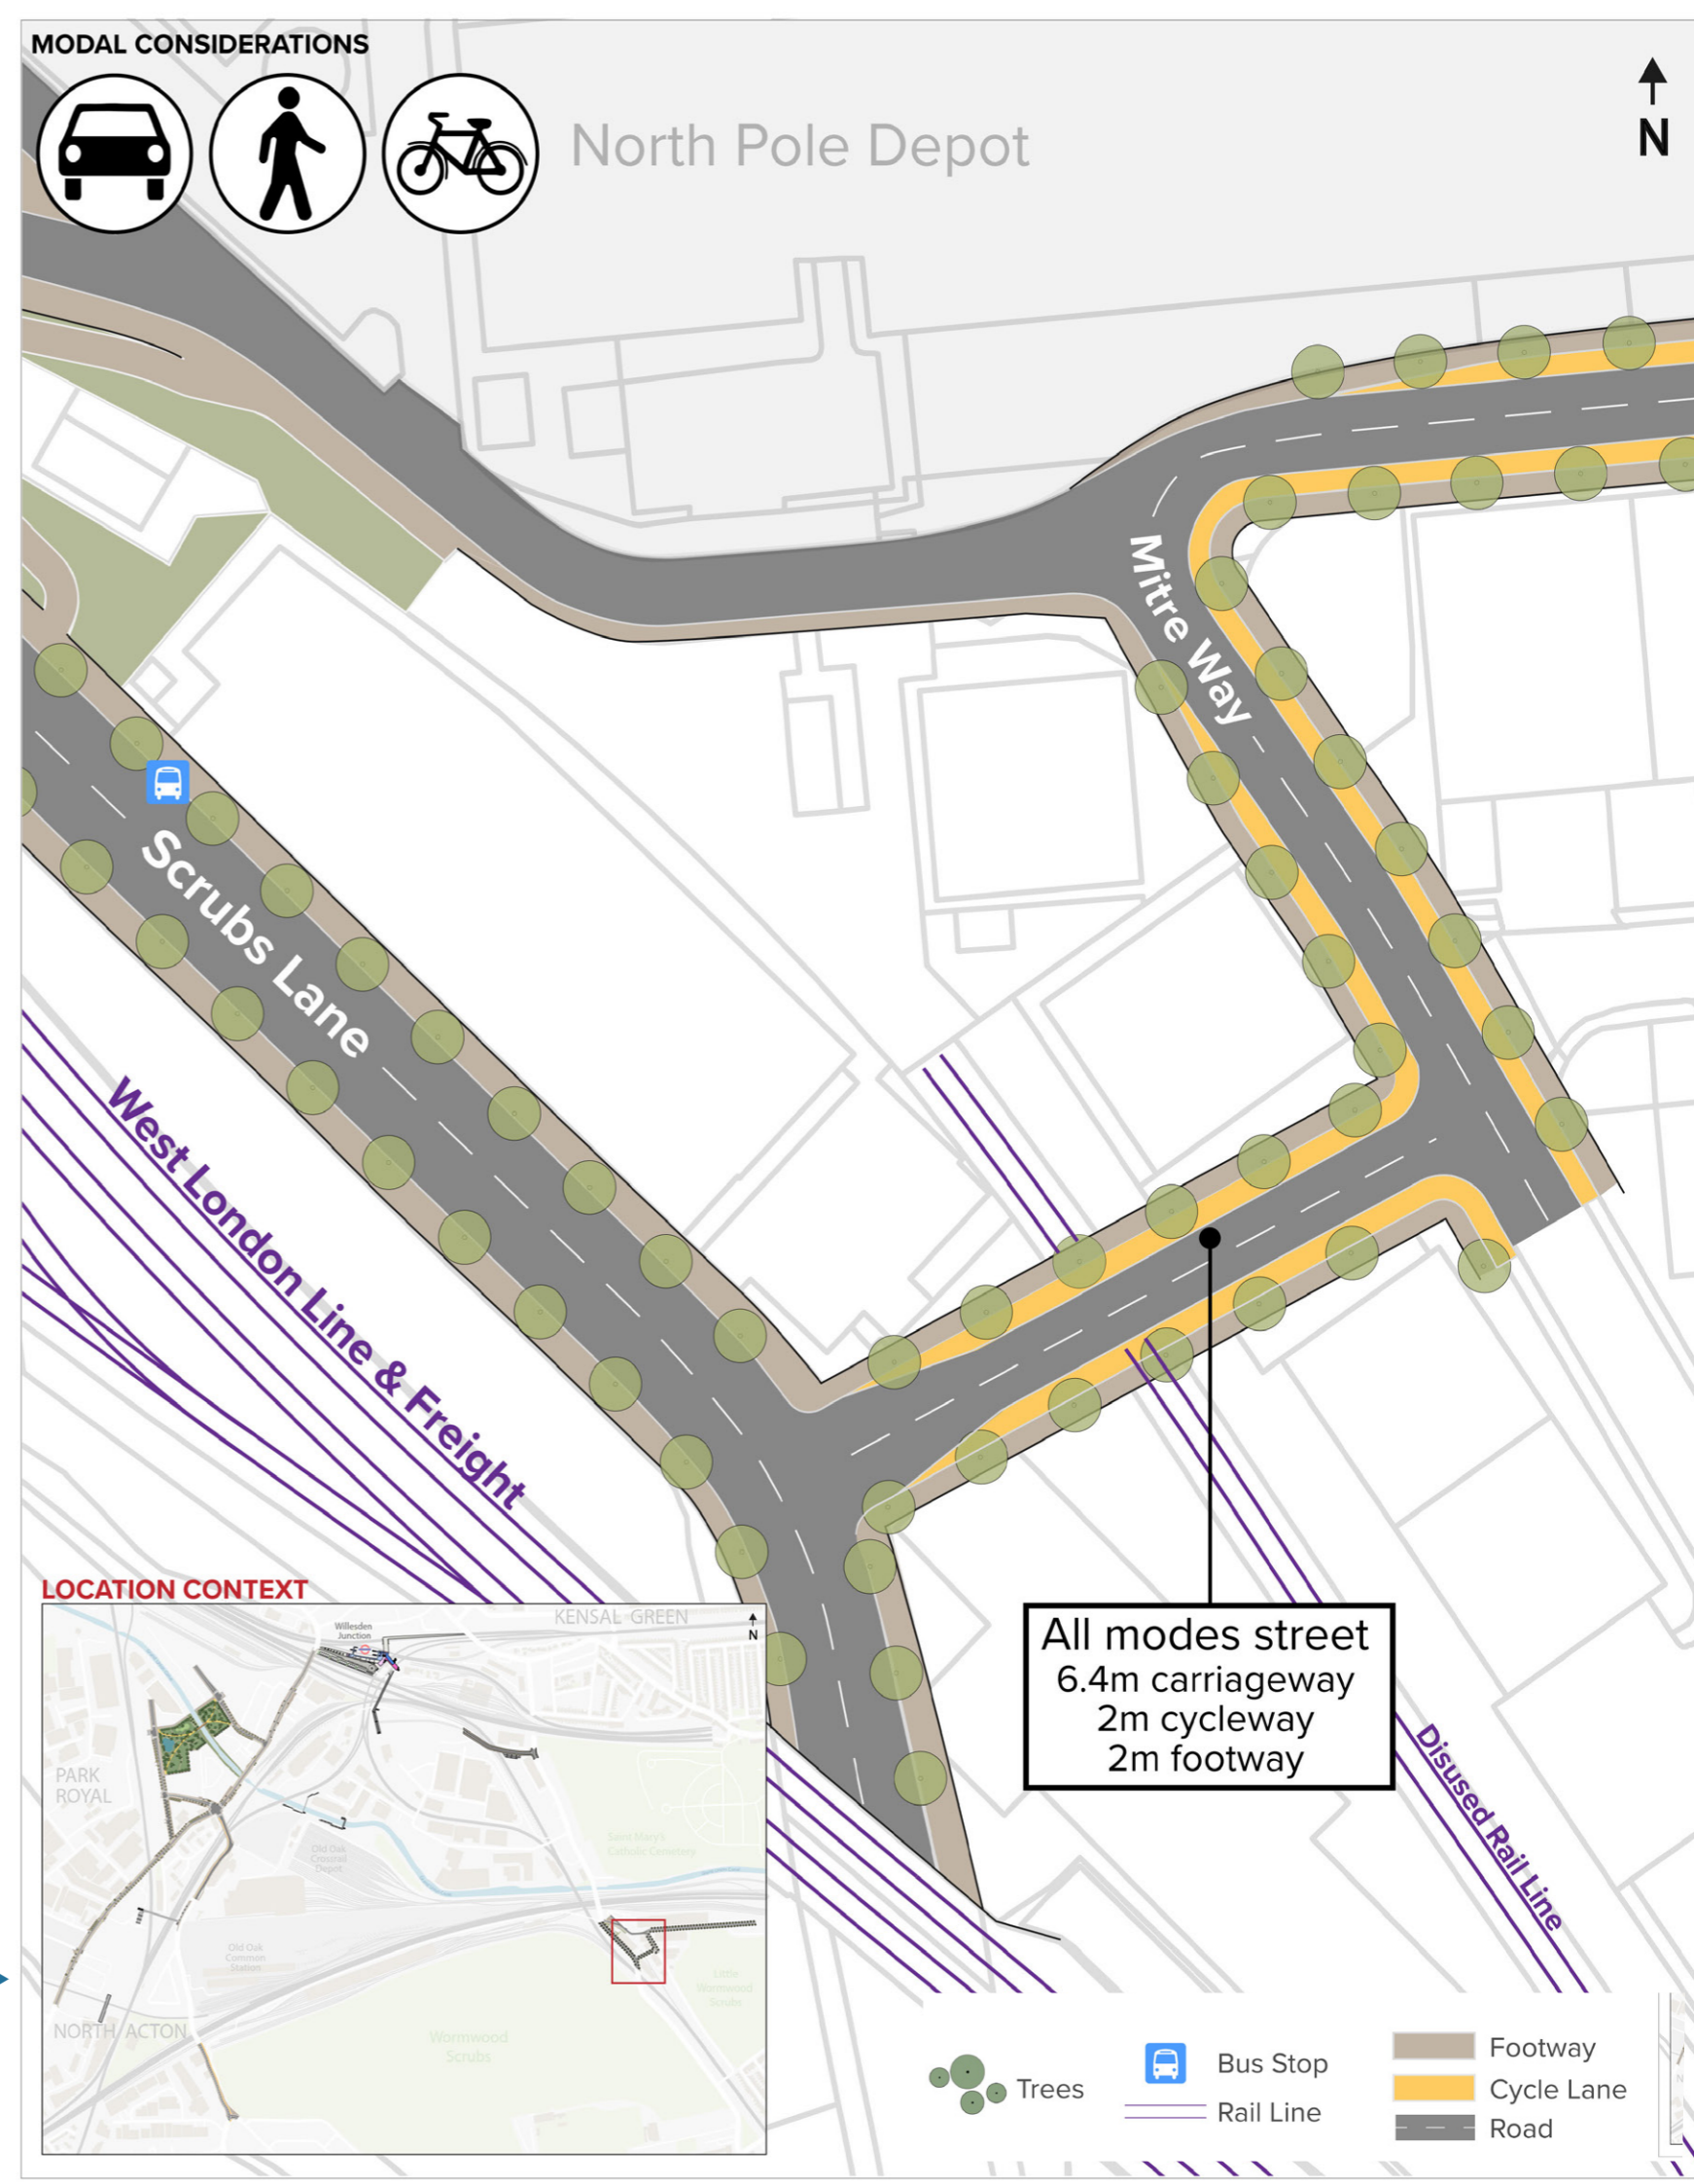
Intervention 14, new 'all modes' street from Scrubs Lane to Mitre Way
